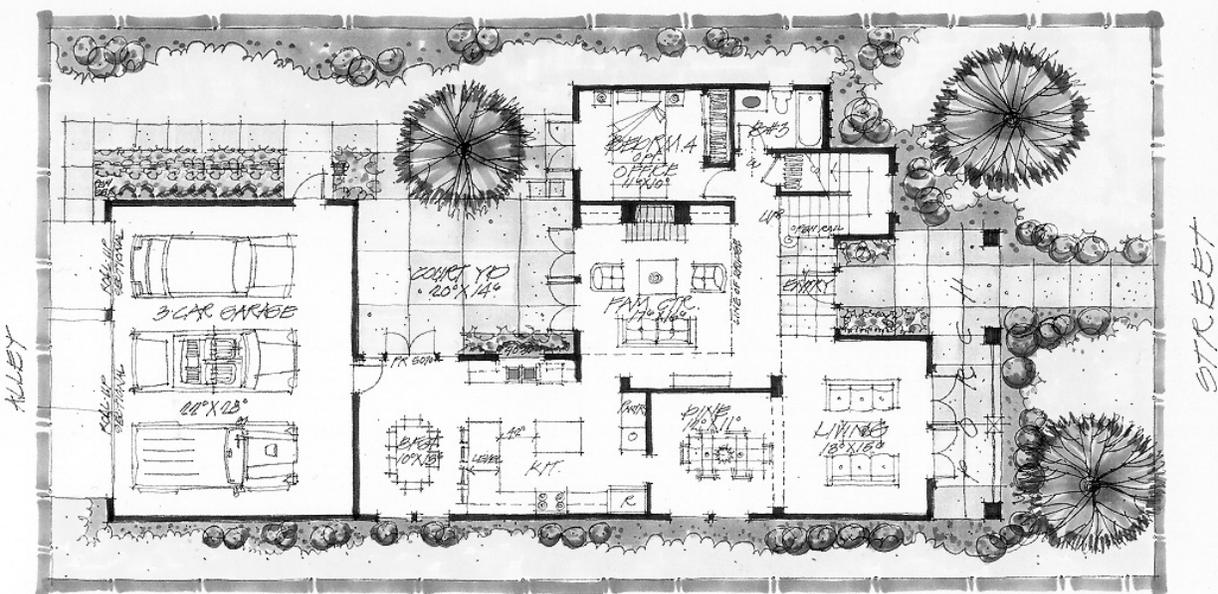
Southern California House Prototype with Alley Access First Floor Plan
